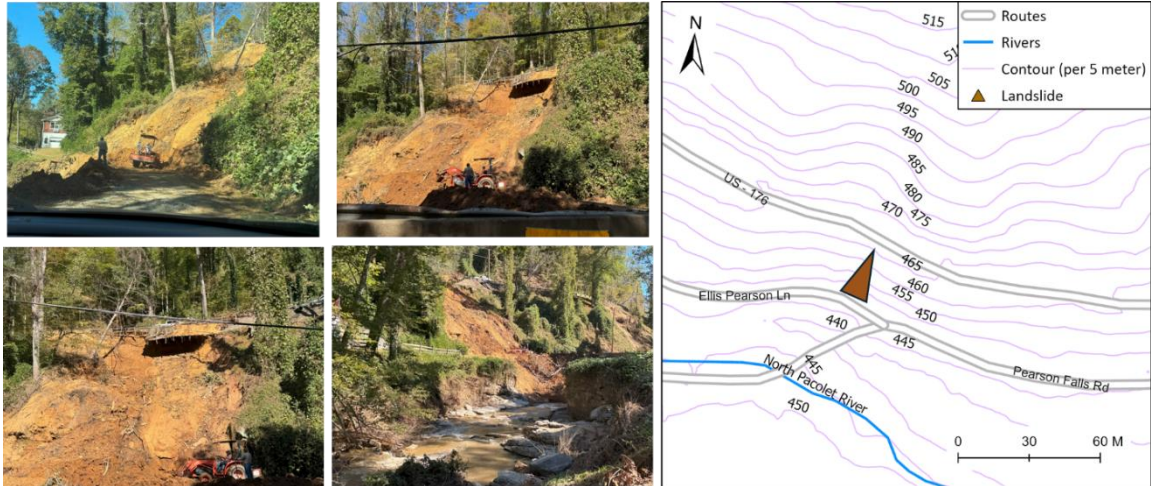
Large debris flows between Highway 176 (road above) and the Pearson Falls Road (road below) next to the North Pacolet River, Melrose Falls, NC. (Photo Credits: Sophia Lin and Shenan Chen)
